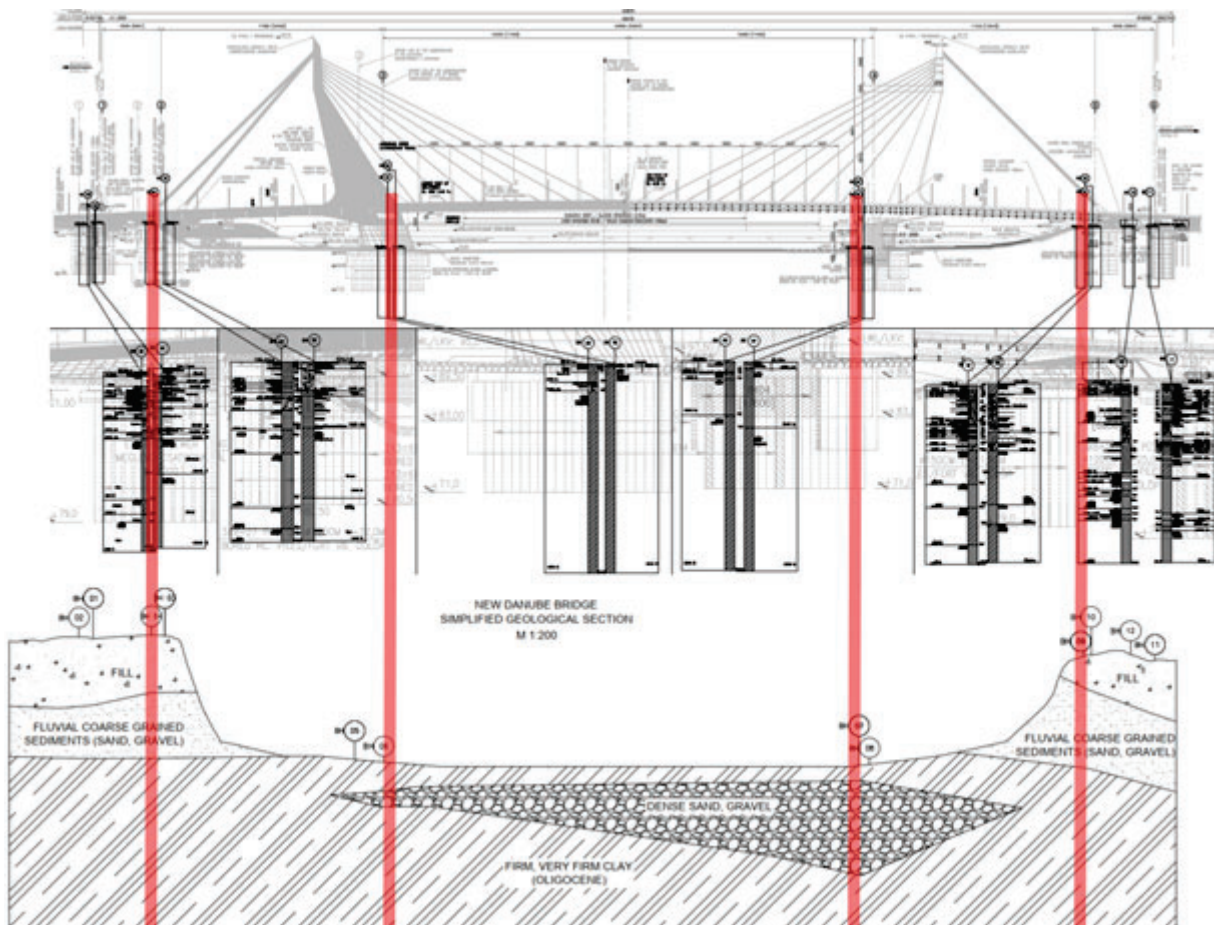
Simplified geotechnical longitudinal section – © CÉH
